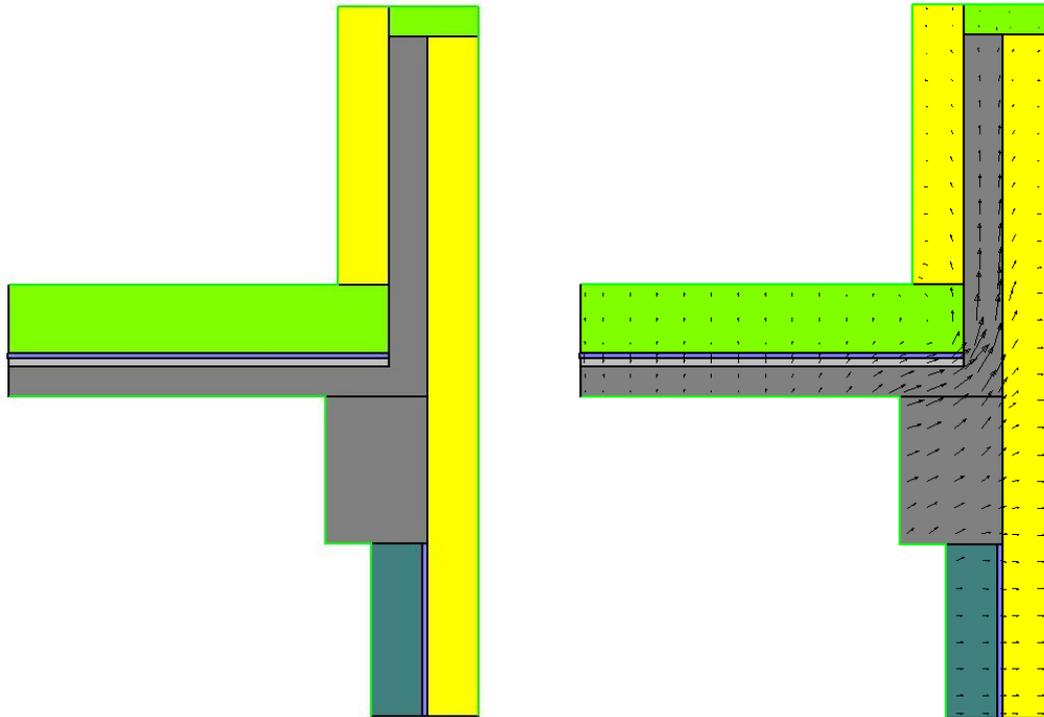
Roof-Wall thermal bridge section and heat flux
